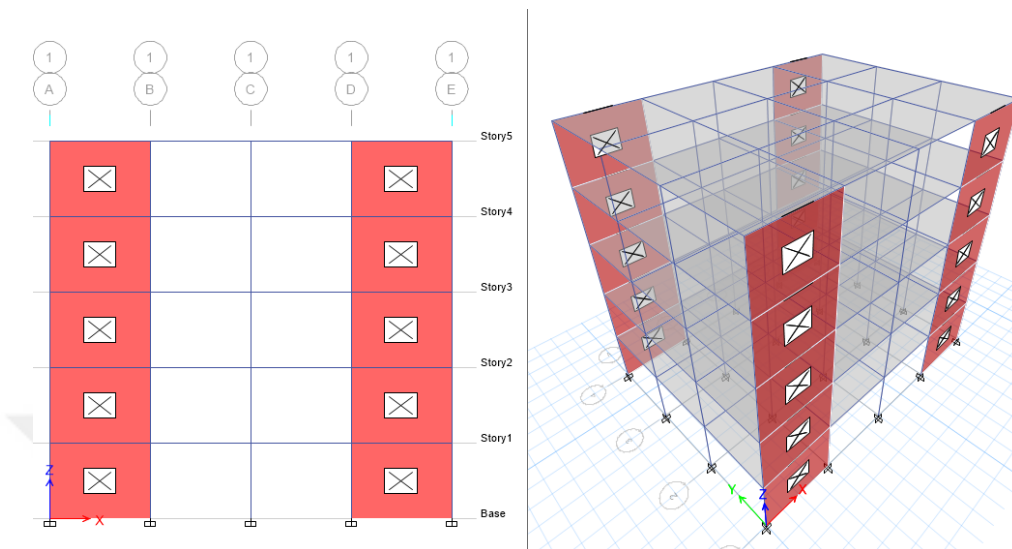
The 5-story building with concrete shear walls and with horizontal openings.
